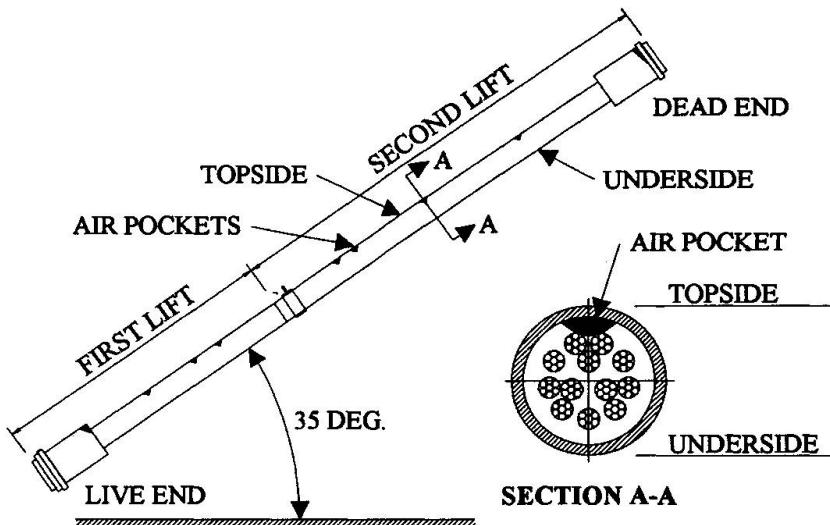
Schematic Elevation of Specimen in Grouting Position
